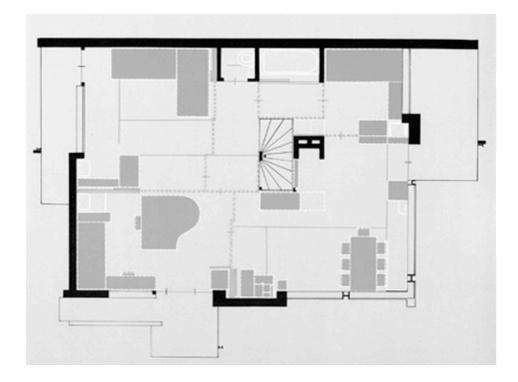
First Floor Plan of Gerrit Rietveld, Schroder House. Source: whc.unesco.org
